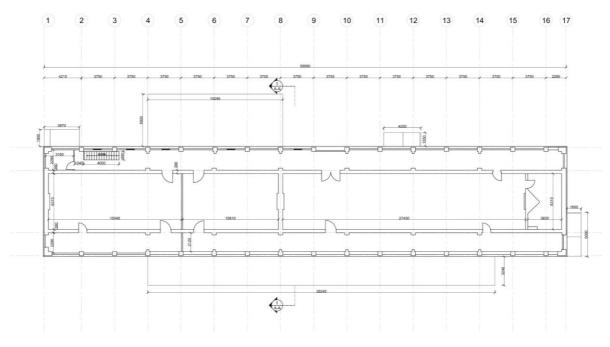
1/F plan, nowadays. (Source: Architectural Services Department)
